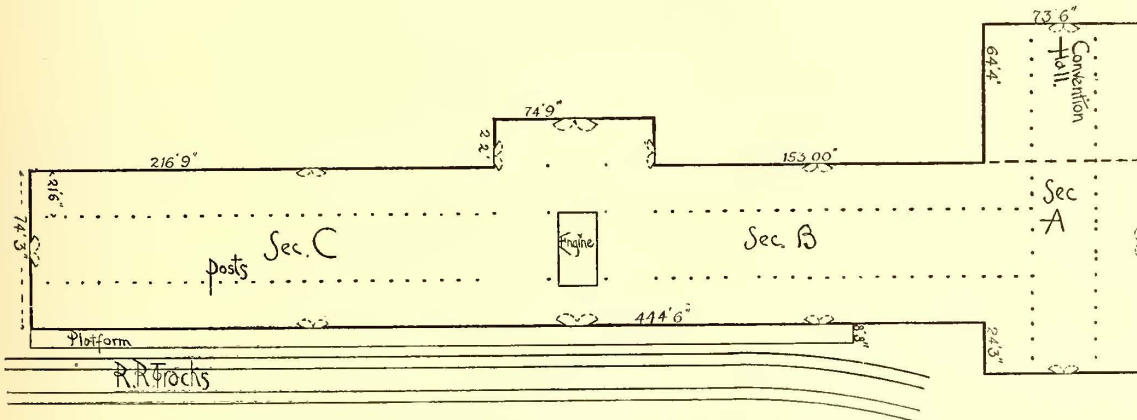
PLAN OF MACHINERY HALL—PIEDMONT PARK, ATLANTA.
